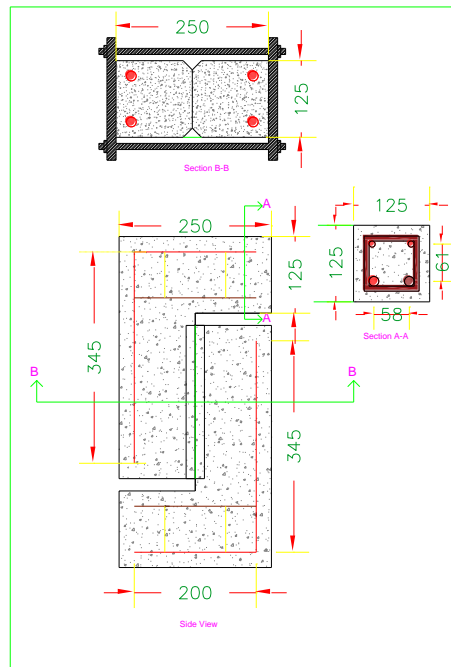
Rebar detailing and push of mold (all dimensions are in mm unit).
